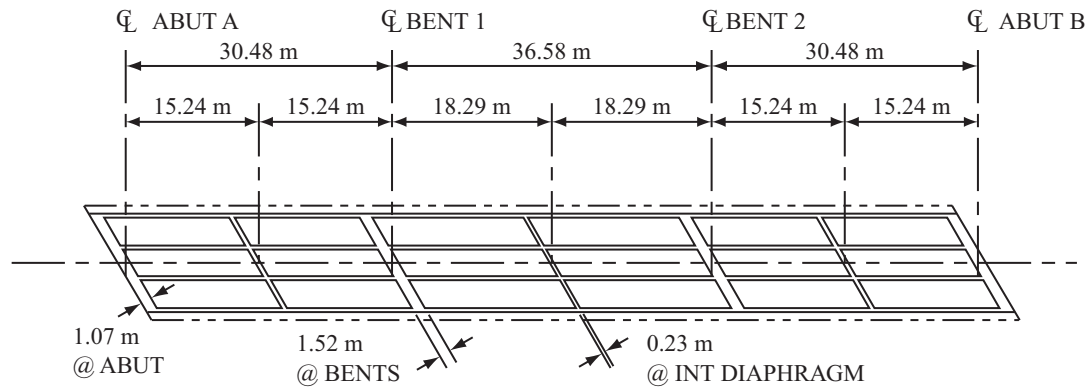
The framing plan of the FHWA No. 4 bridge (Courtesy of the FHWA).
